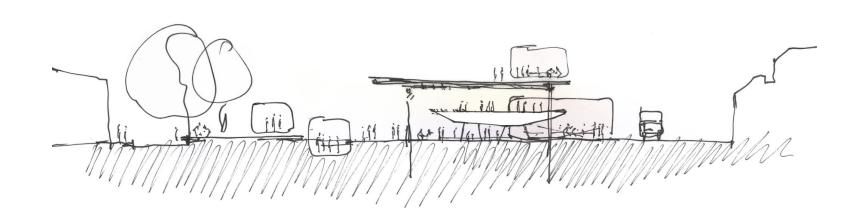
Initial concept sections highlighting key design moves - a landscape that extends through the building, a platform suspended above the ground, and a simple roof.
